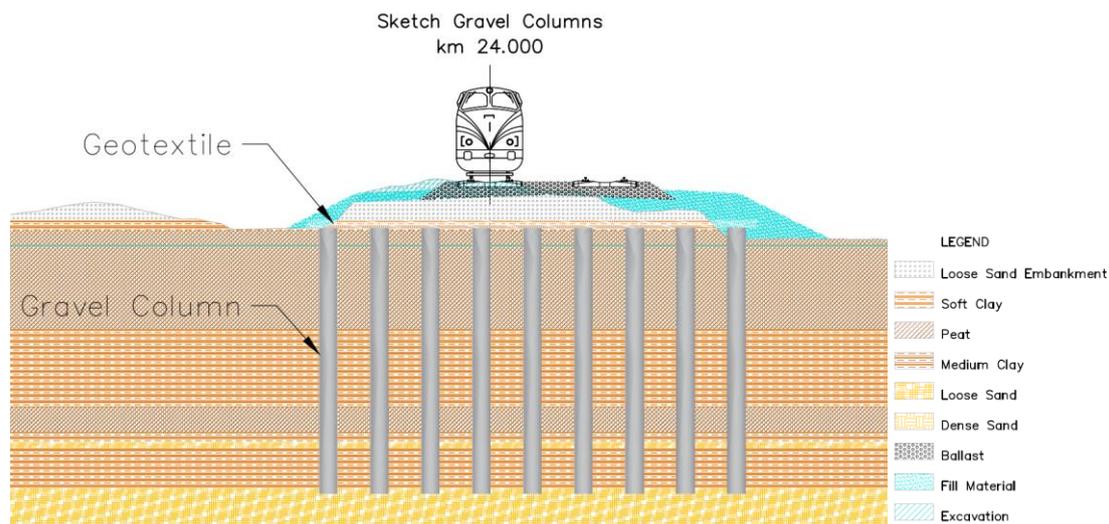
Sketch of the Gravel Column Stabilization Method at km 24.0 (not to scale)
